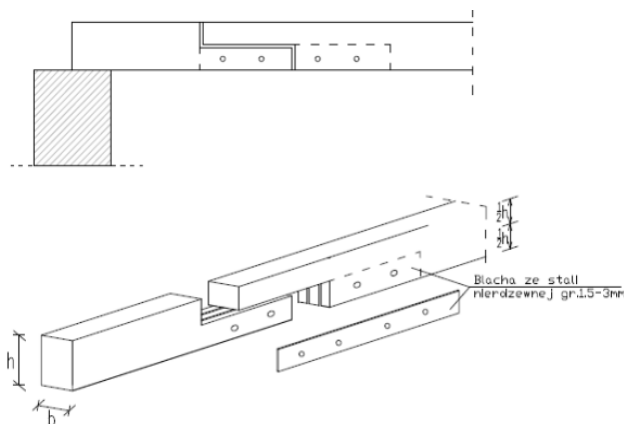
Replacement of the damaged beam fragment using the inserts made of flat steel plate with a thickness of 1.5 to 3 mm and stud connectors (drawing: E. Piotrowicz)
